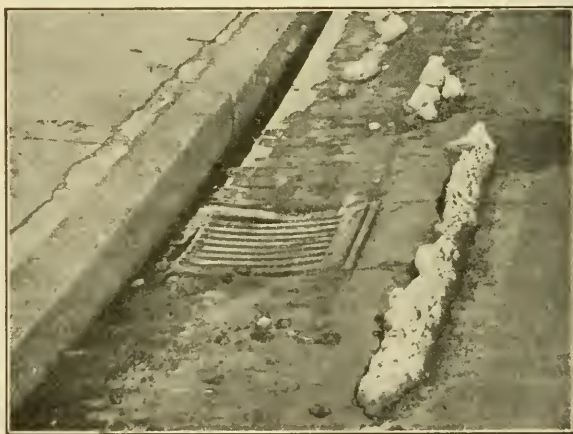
Gutter inlet to catch basin. Useful type where the drainage area is small.
